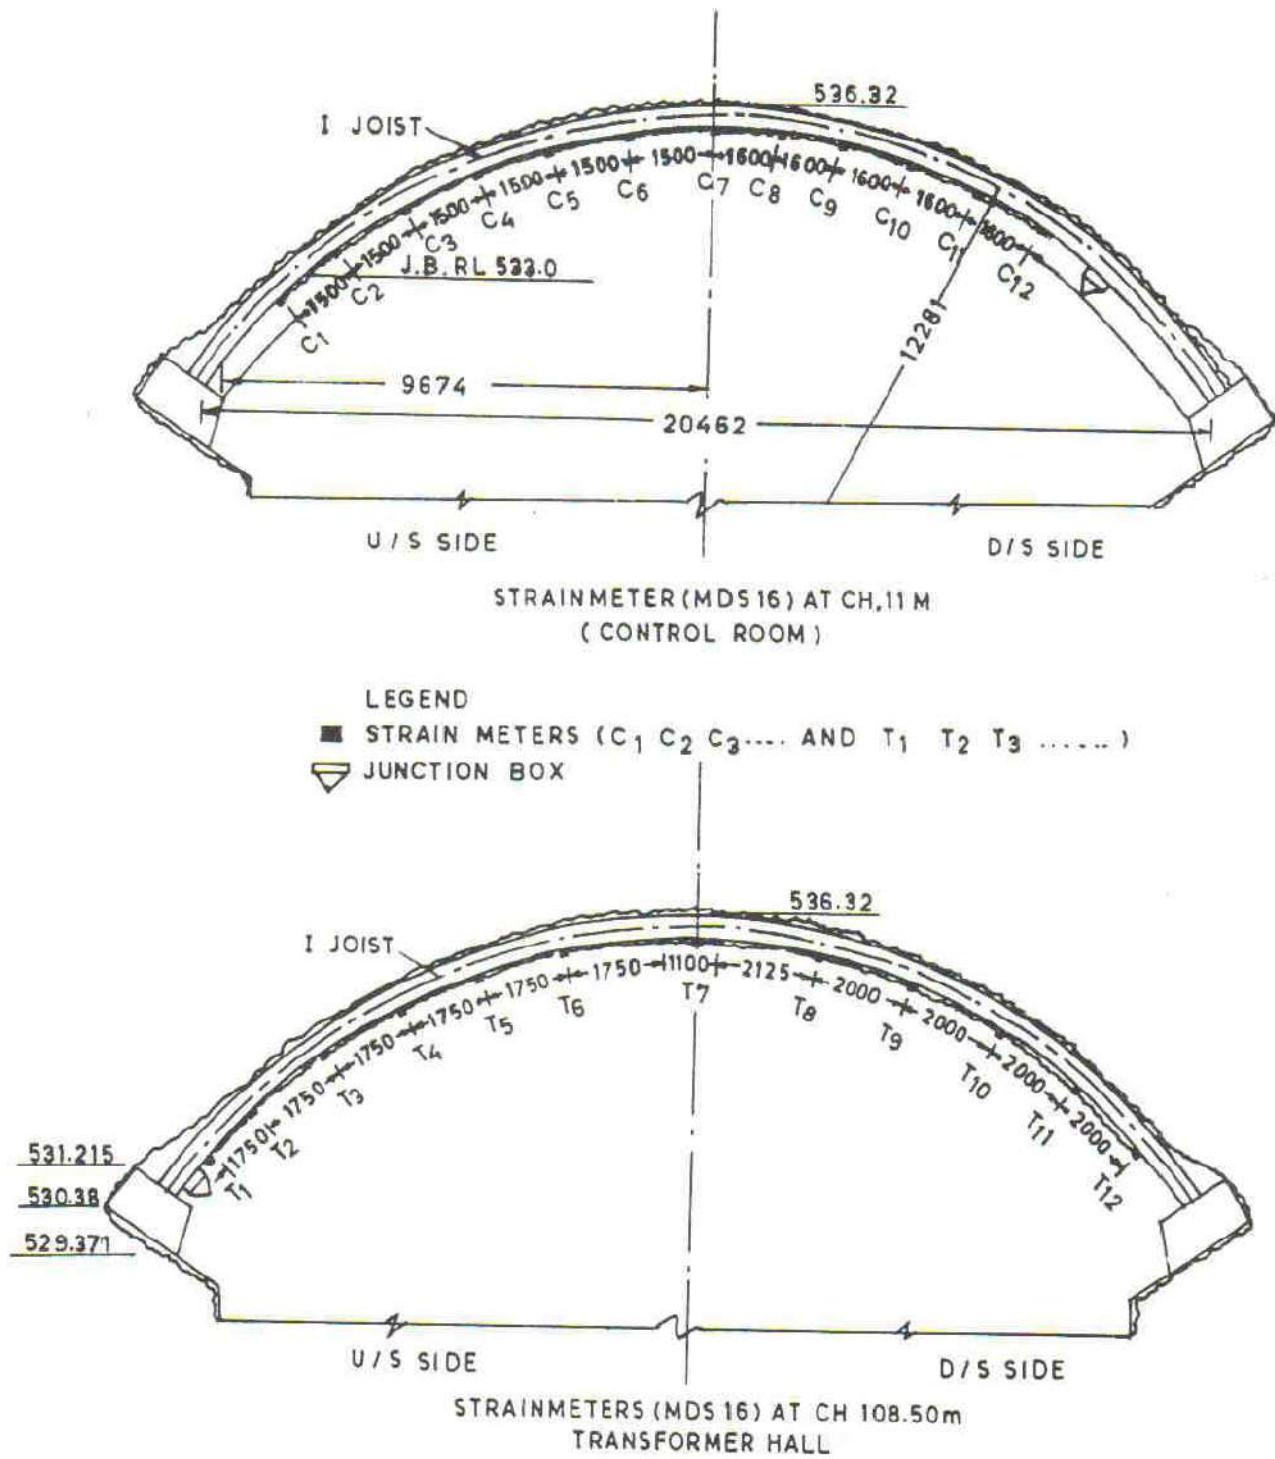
INSTALLATION DETAILS OF STRAIN METERS IN THE STEEL RIBS OF POWER HOUSE CAVITY
